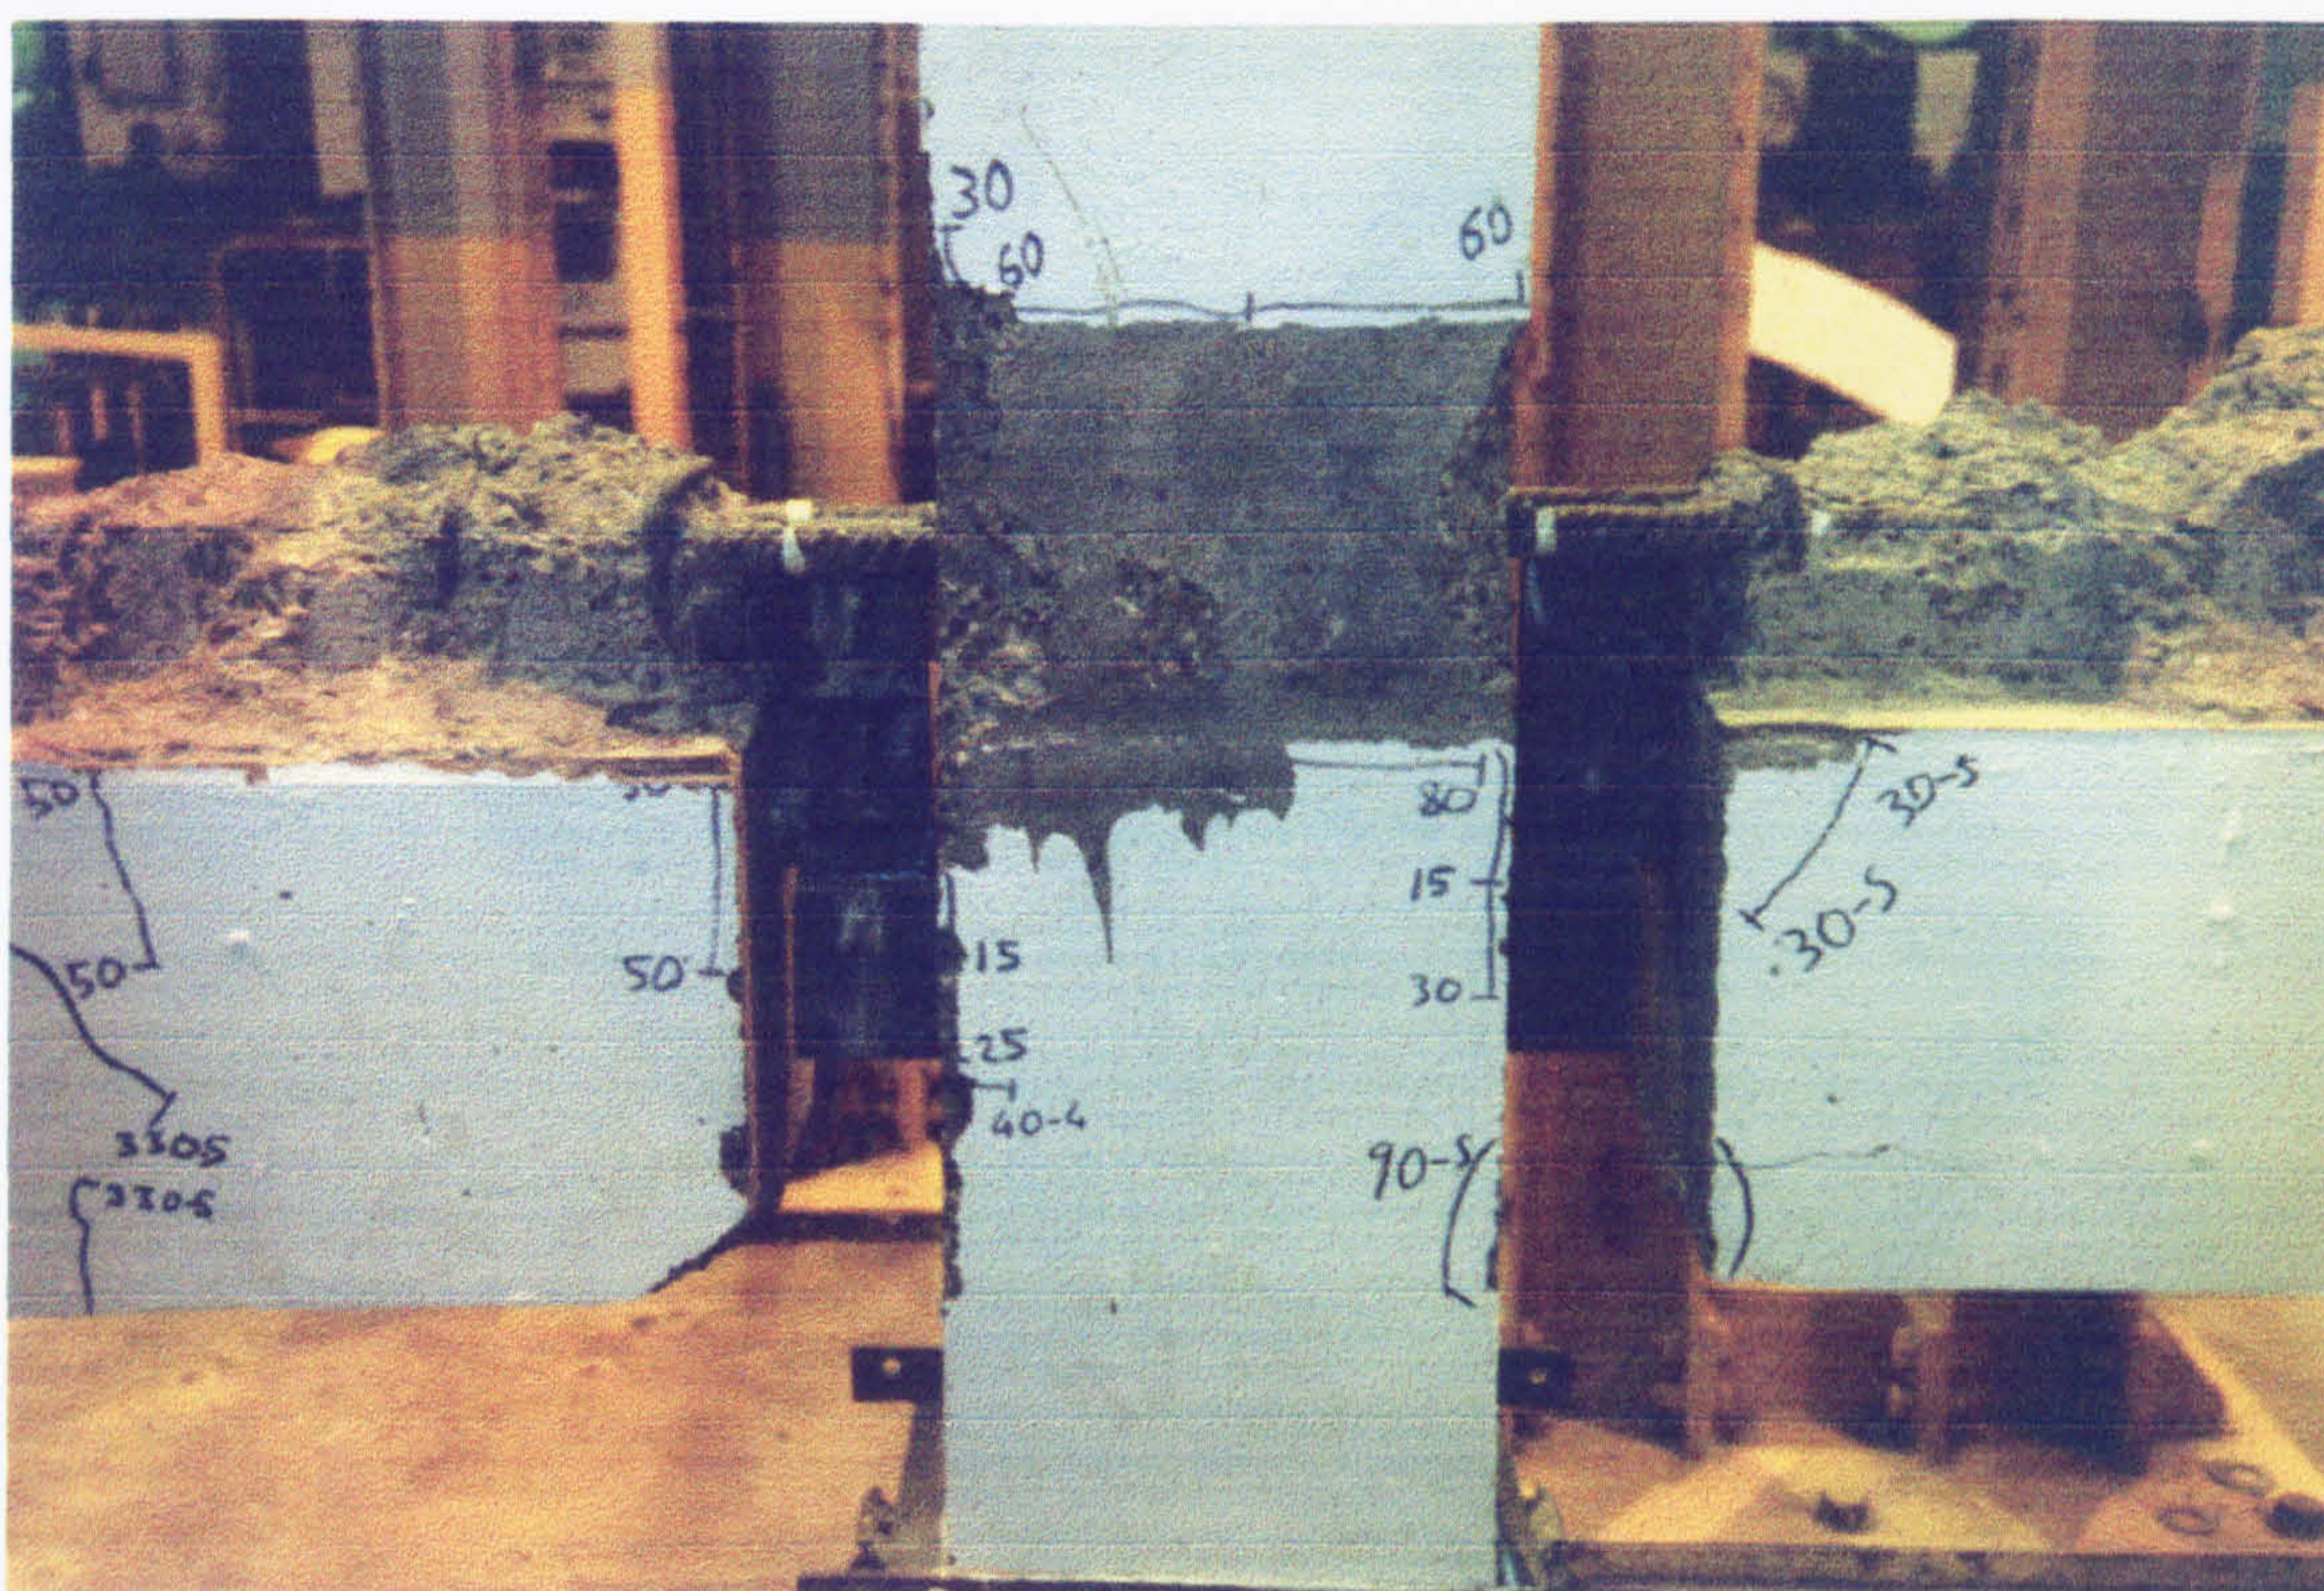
Damaged regions in the precast members from West after testing TW1(B)
